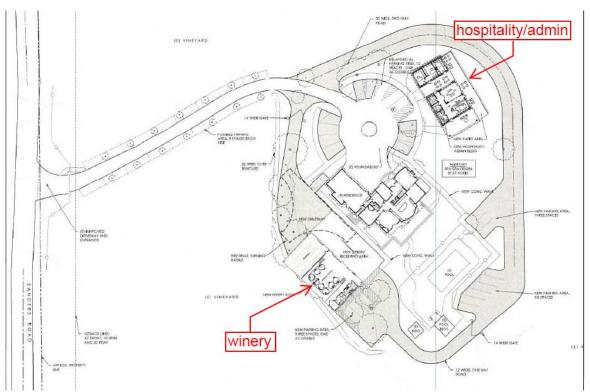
Project Site Plan (Source: Steve Martin Associates, Inc.)
